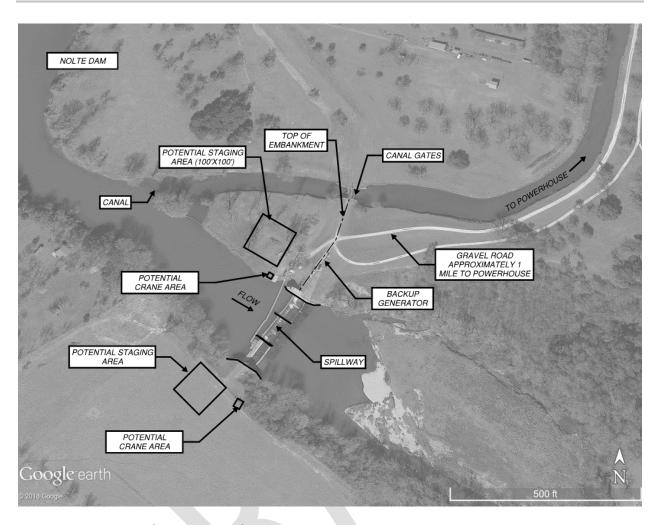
Nolte (Meadow Lake) Spillway Site Plan
